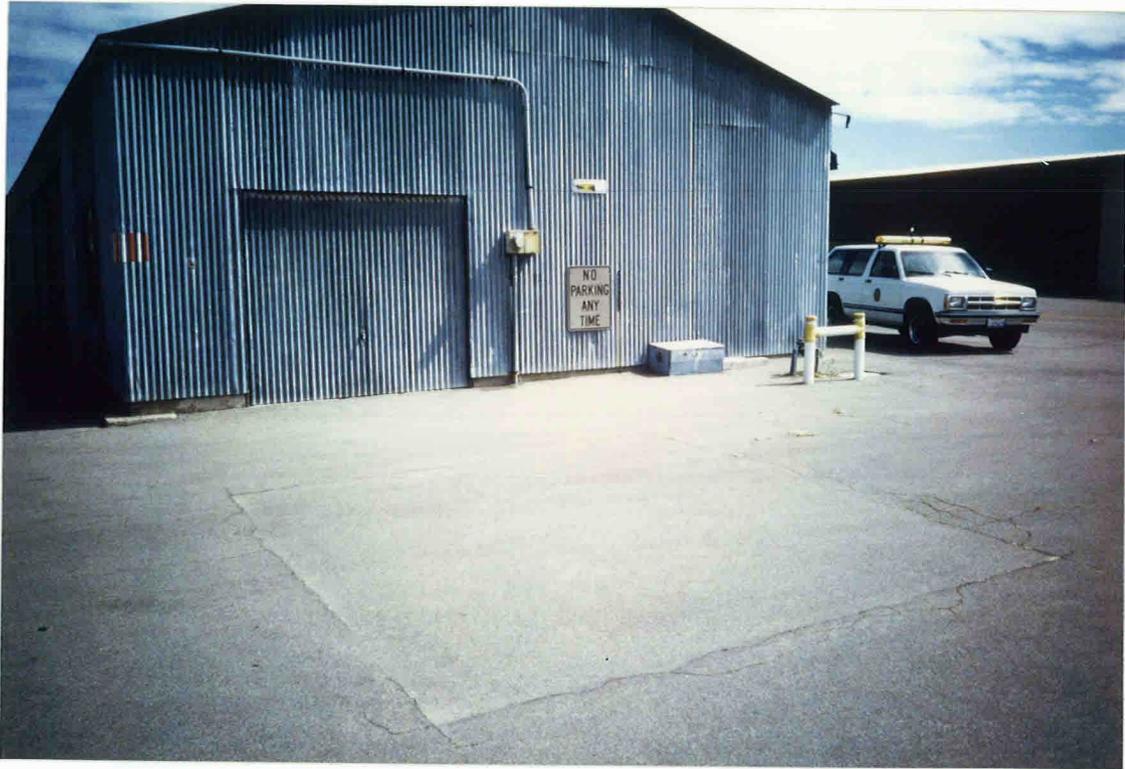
West end of old 4-plane hangar. Possible UST location.
